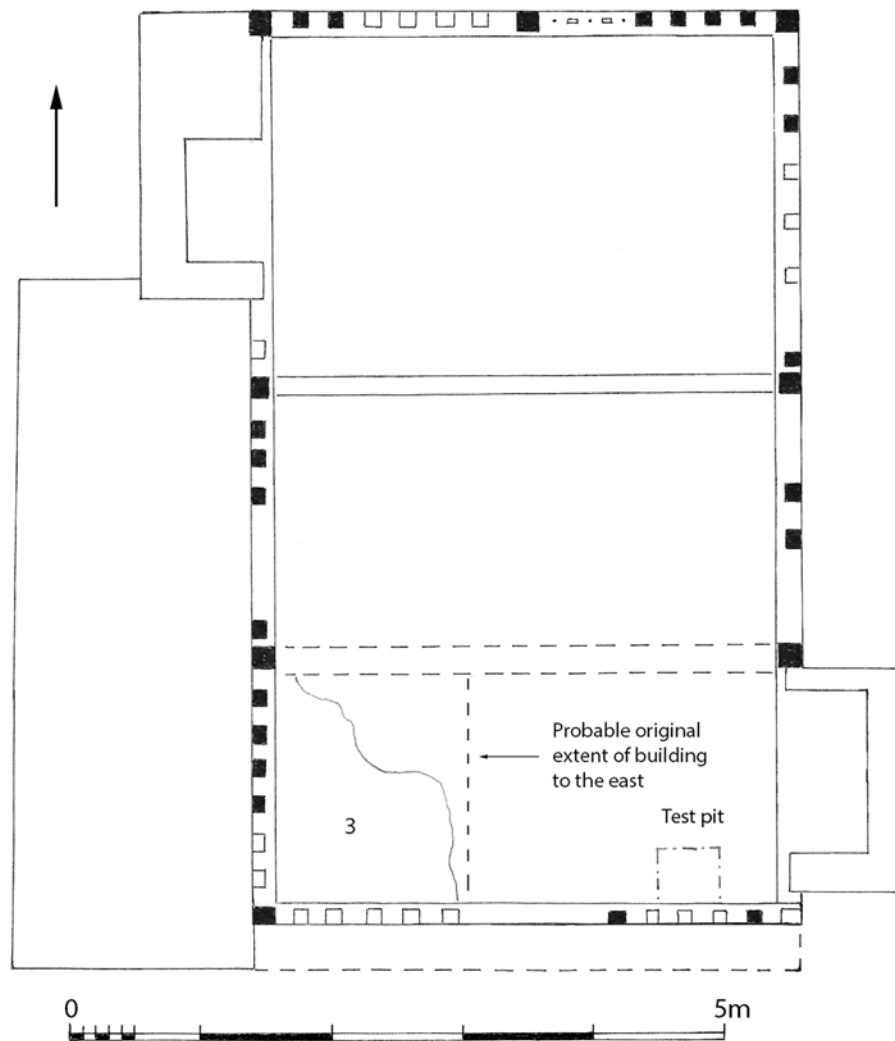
Bullocks Cross, plan to illustrate the timber frame
